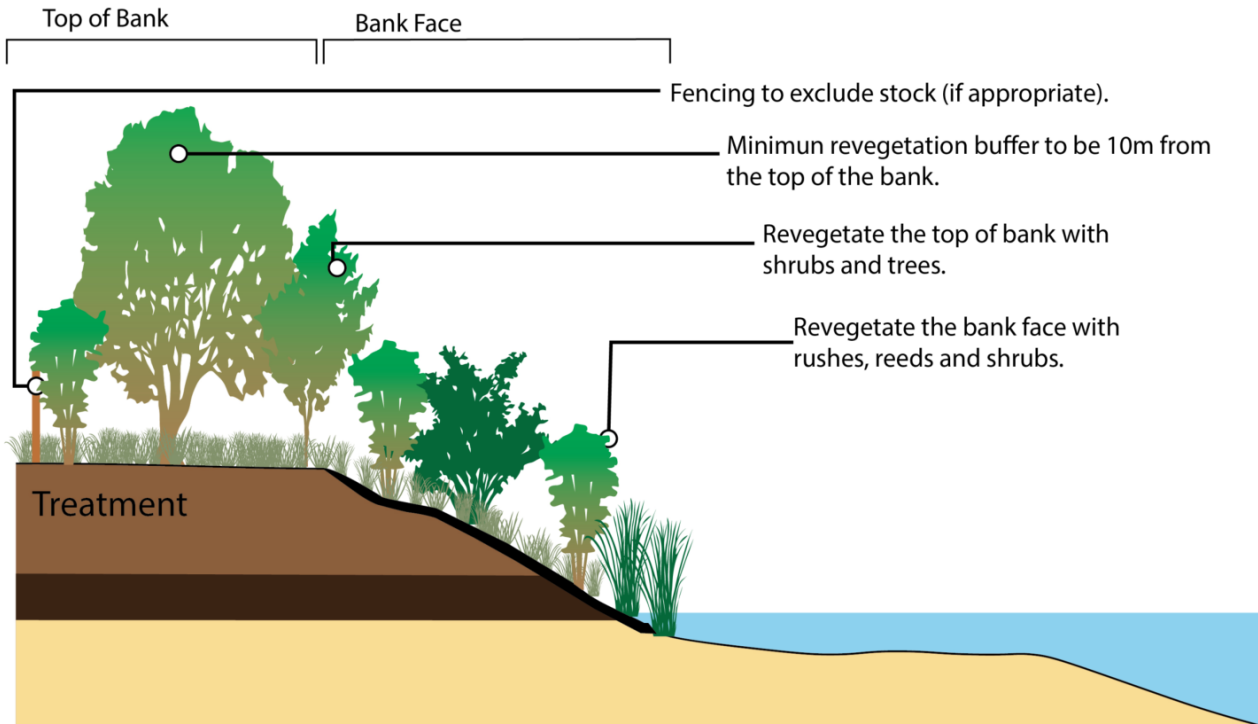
CONCEPT REVEGETATION ARRANGEMENT FOR A SLOPED BANK PROFILE.
